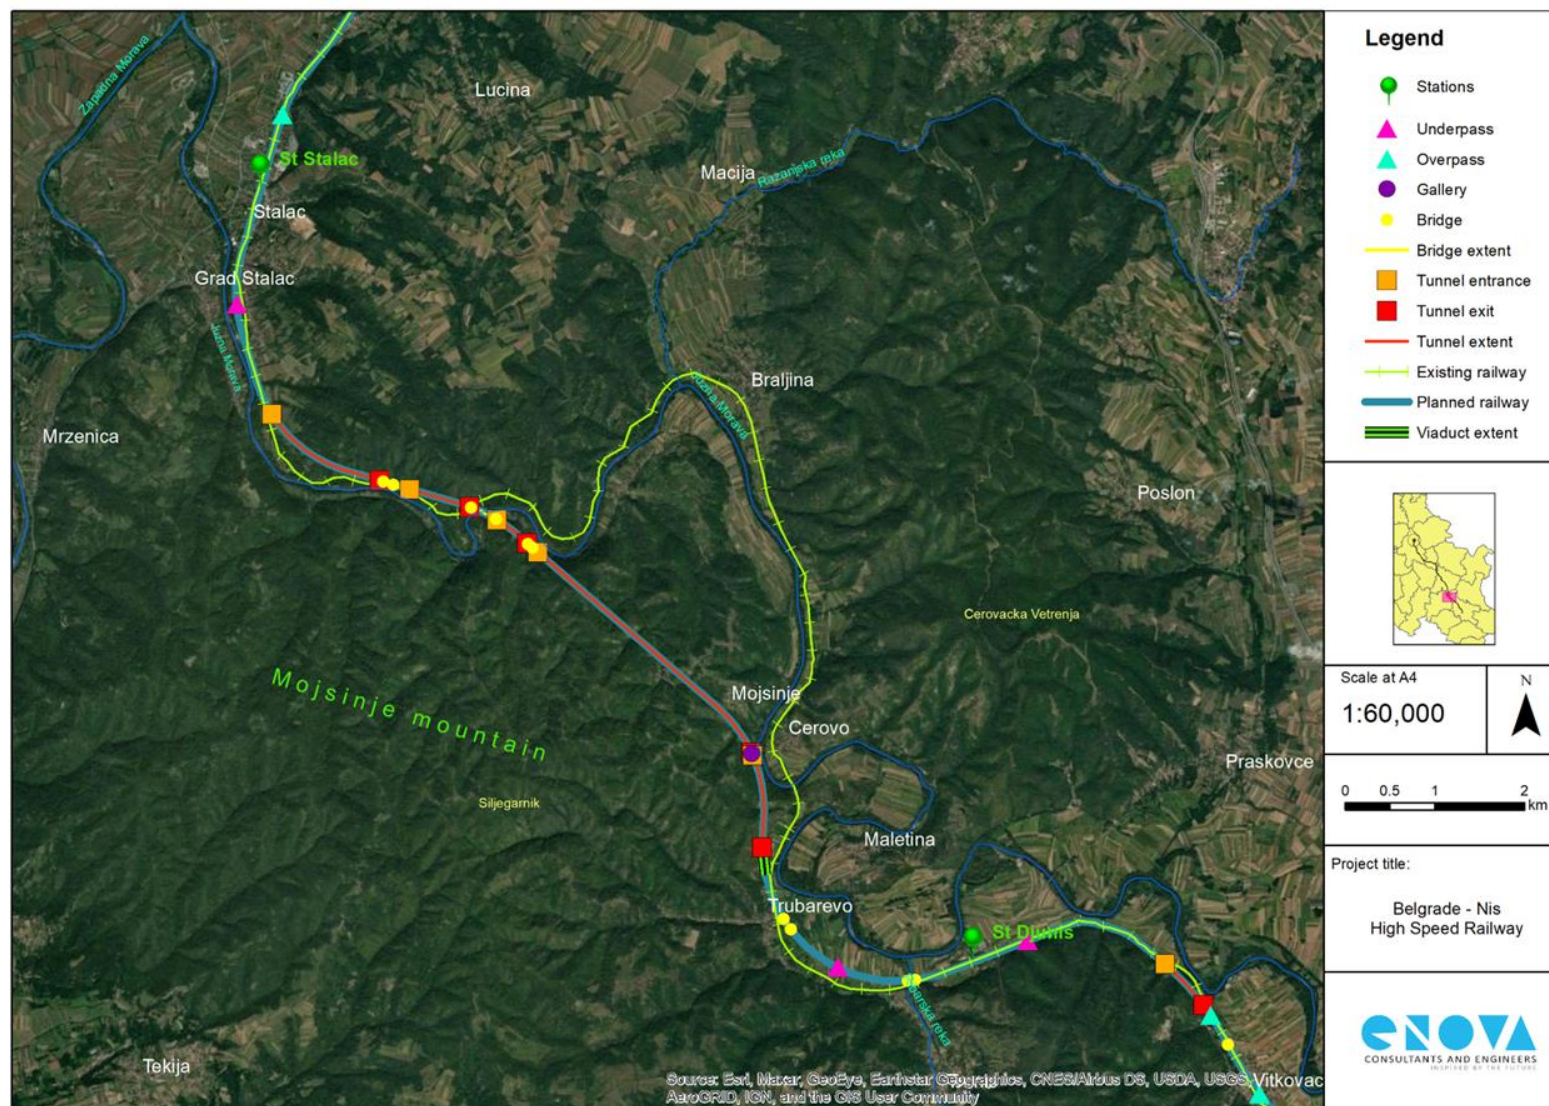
Existing and planned railway with ancillary structures (Stalac-Djunis subsection)
